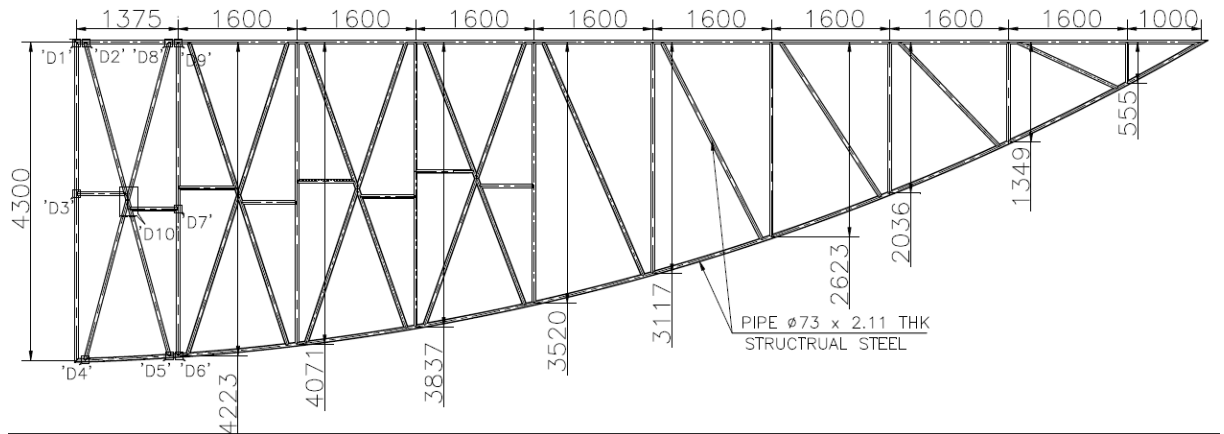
a: Different type of Al-Al pipe weld required in structure
